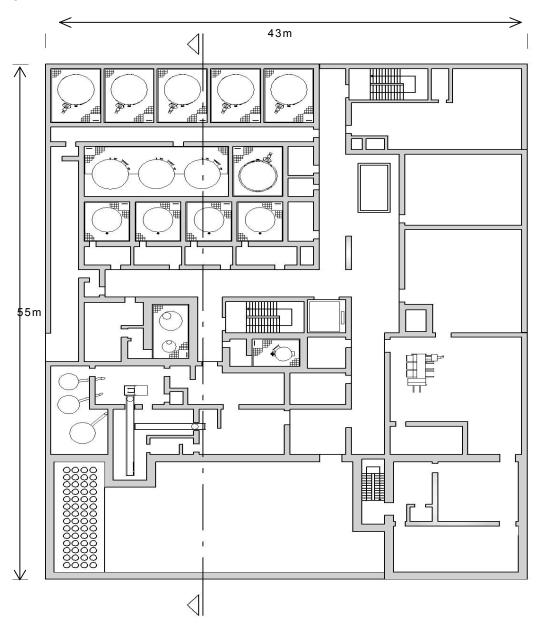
FLOOR LAYOUT OF A WTB SHOWING TYPICAL DIMENSIONS
